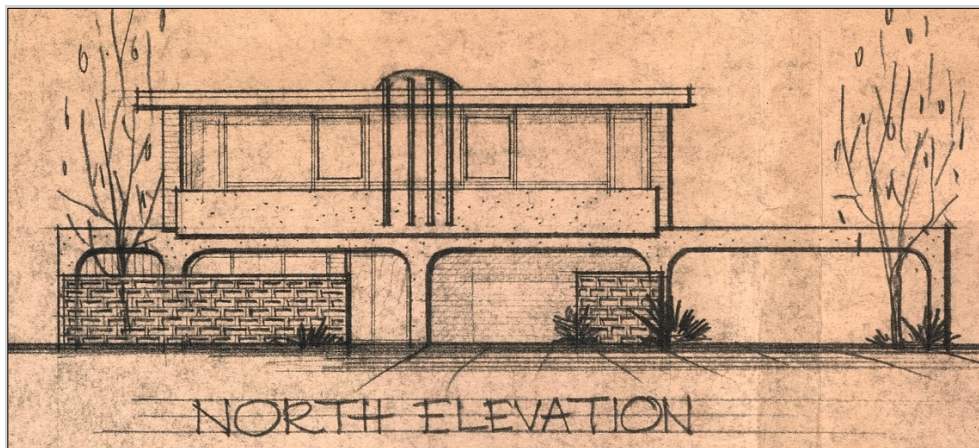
North Elevation from May 1968 Sketch Plan documentation, prepared by David Spair and Associates, and stamped by Council 31 May 1968, showing an initial façade design.
